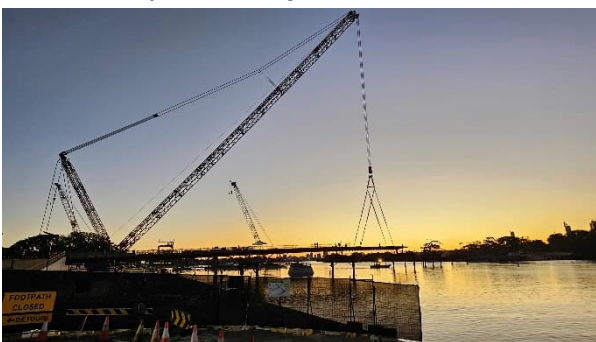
1600-ton crawler crane installing module 5 of McCallum Park Bridge
